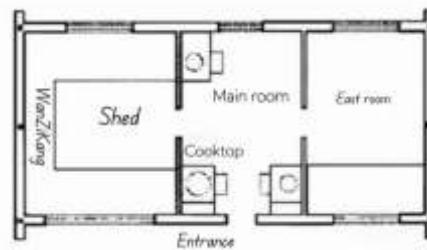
Pocket Room Floor Plan (Drawn by The Author, 2024)
